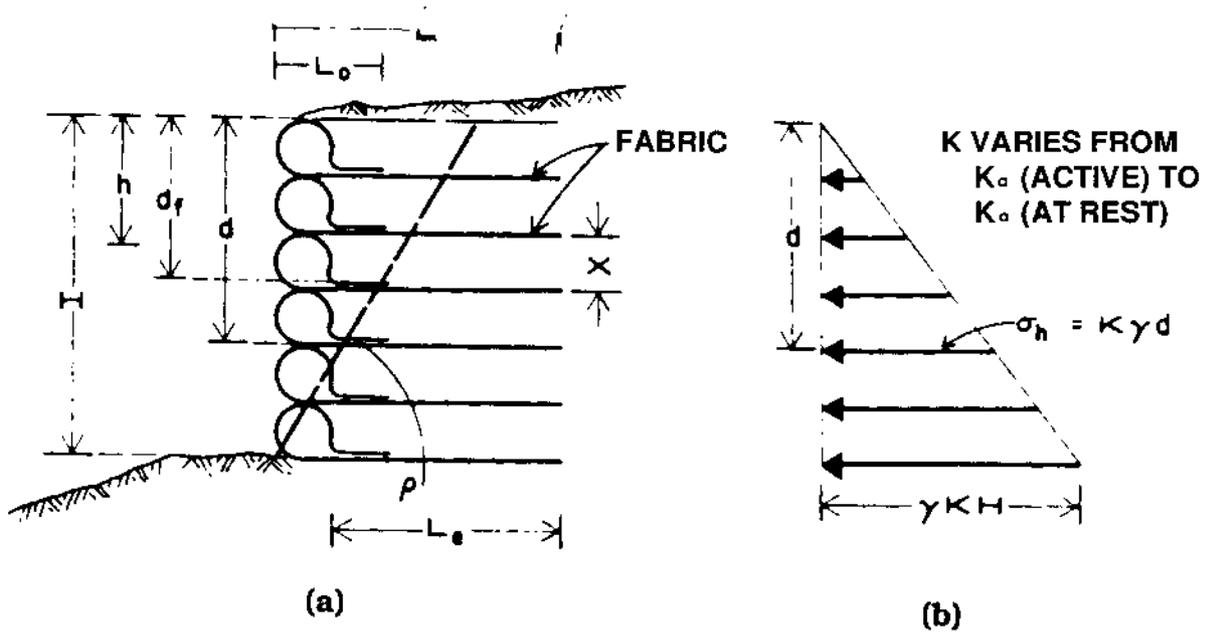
Geotextile wall — earth pressure distribution (Driscoll, 1979 and Steward, et. al.).
